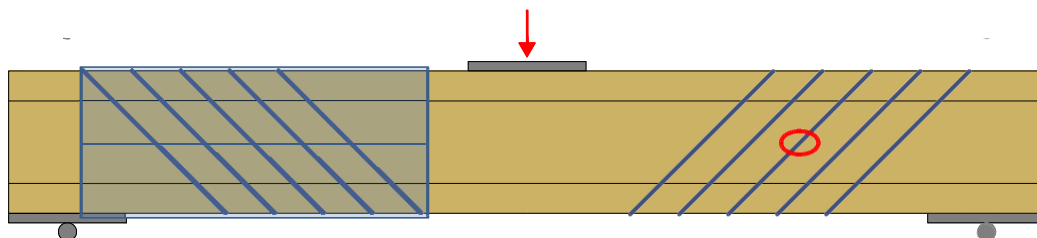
Principle of a shear reinforced beam using screws; marked area is reinforced
